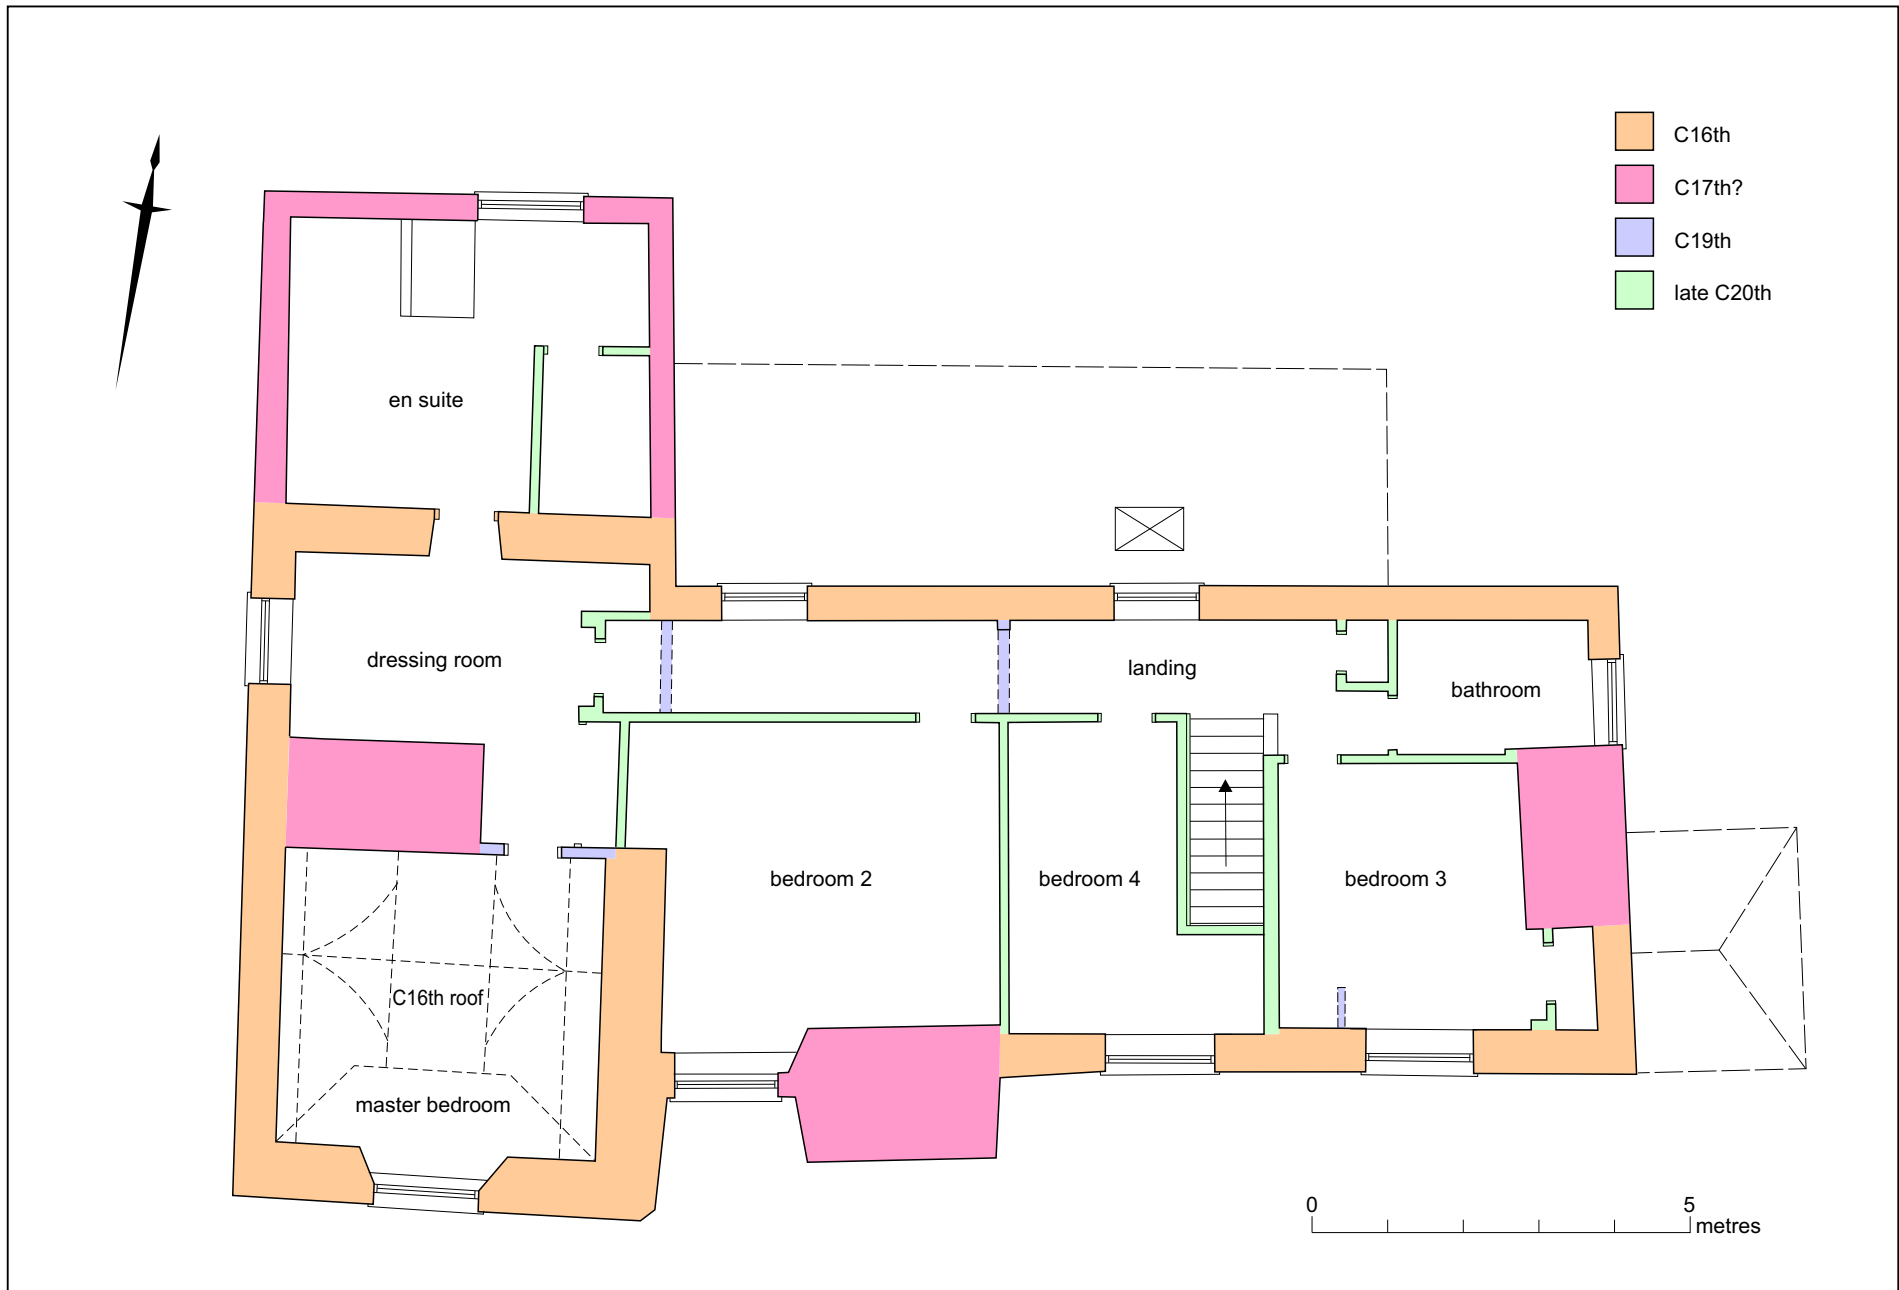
East Densham Farmhouse, first floor phase plan. Scale 1:100.
